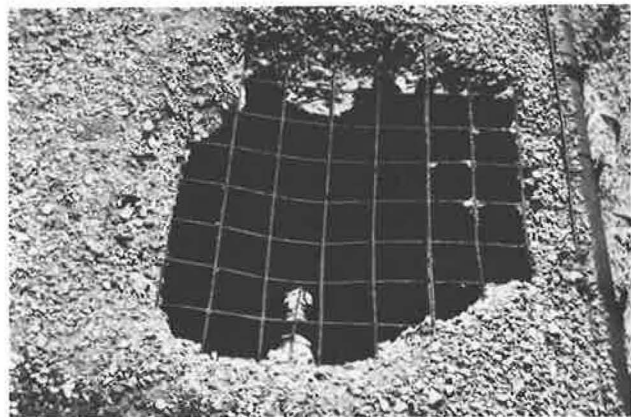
Complete separation of concrete from reinforcing steel on walkway of bridge shown in Figure 9.
